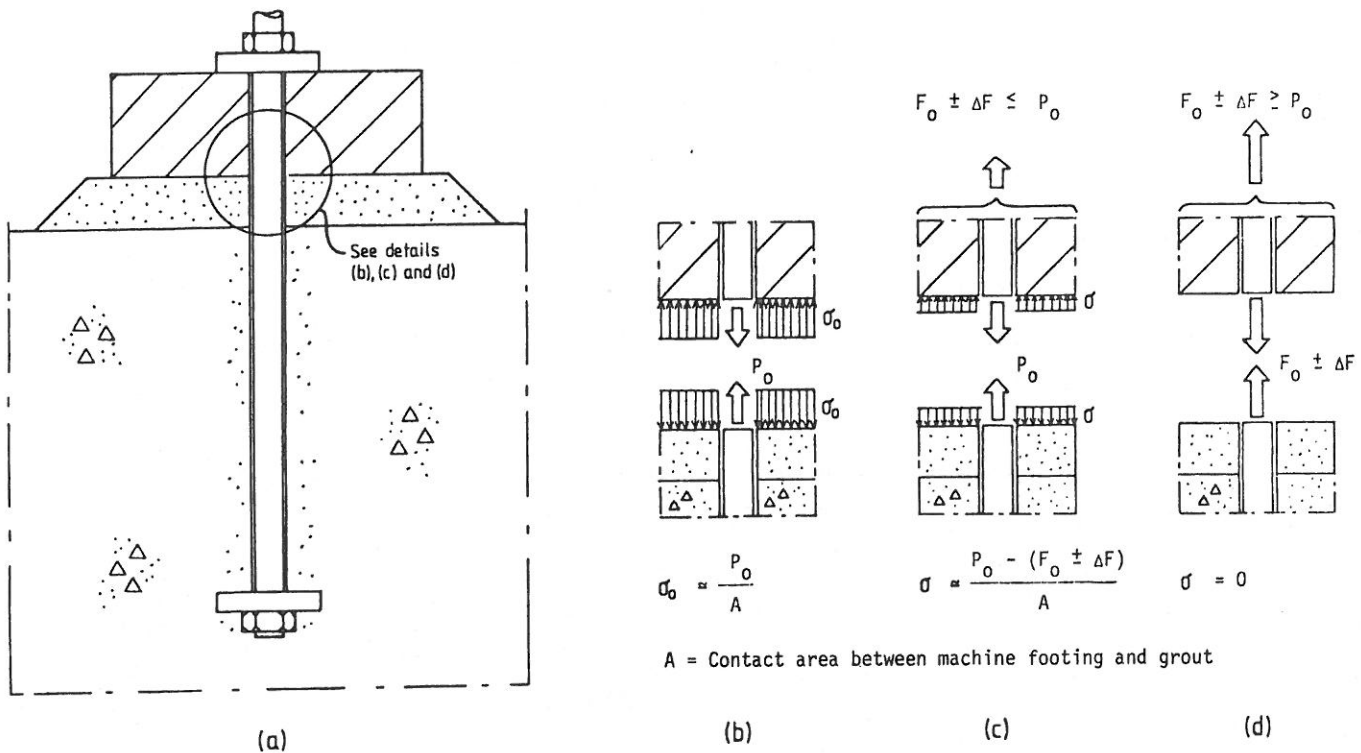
Function of a prestressed anchor bolt. In (a) a general view is shown, in (b)-(d) details are given of the forces in the anchor bolt and of the stresses between the machine footing and the foundation grout. Detail (b) illustrates the case when only the prestress force P_0 is acting. In detail (c) the applied load $F_0 \pm \Delta F$ is smaller than P_0 . Only a slight stress variation occurs in the bolt. In detail (d) the applied force $F_0 \pm \Delta F$ is greater than P_0 . The load variation $\pm \Delta F$ must then be carried by the bolt alone. See Appendix A for further details
